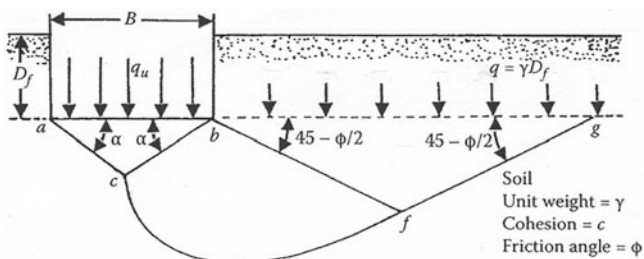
Failure surface in soil at ultimate load for a rough rigid strip foundation as assumed by Terzaghi [24]
